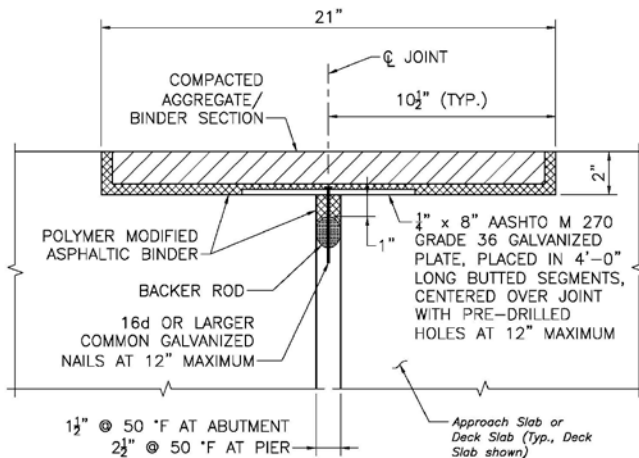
Asphalt Plug Joint Details (MassDOT 2013)
